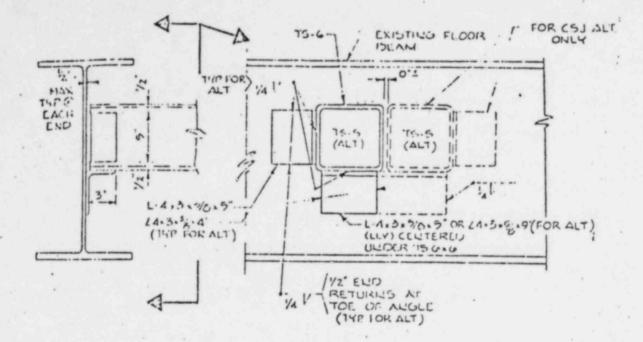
TYPICAL UPPER & LOWER SUPPORT COLUMN CONNECTION.
